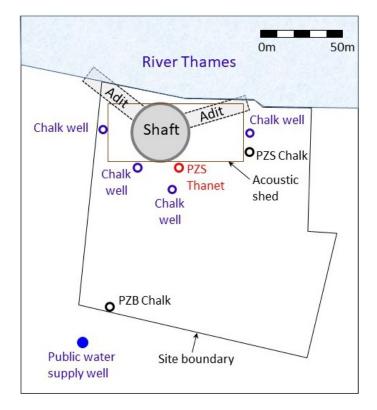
Plan view of Tideway project drive shaft and adit located 120 m distant to a public water supply well
